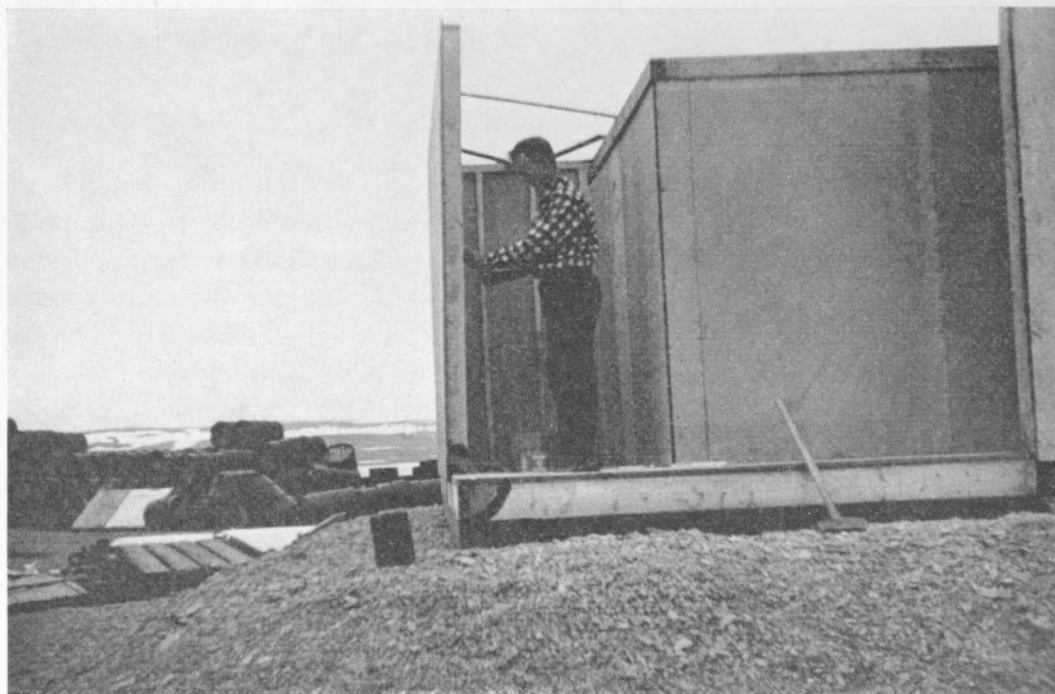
The recorder building under construction. The inside recording room has been completed and the outer protecting building is being erected.
